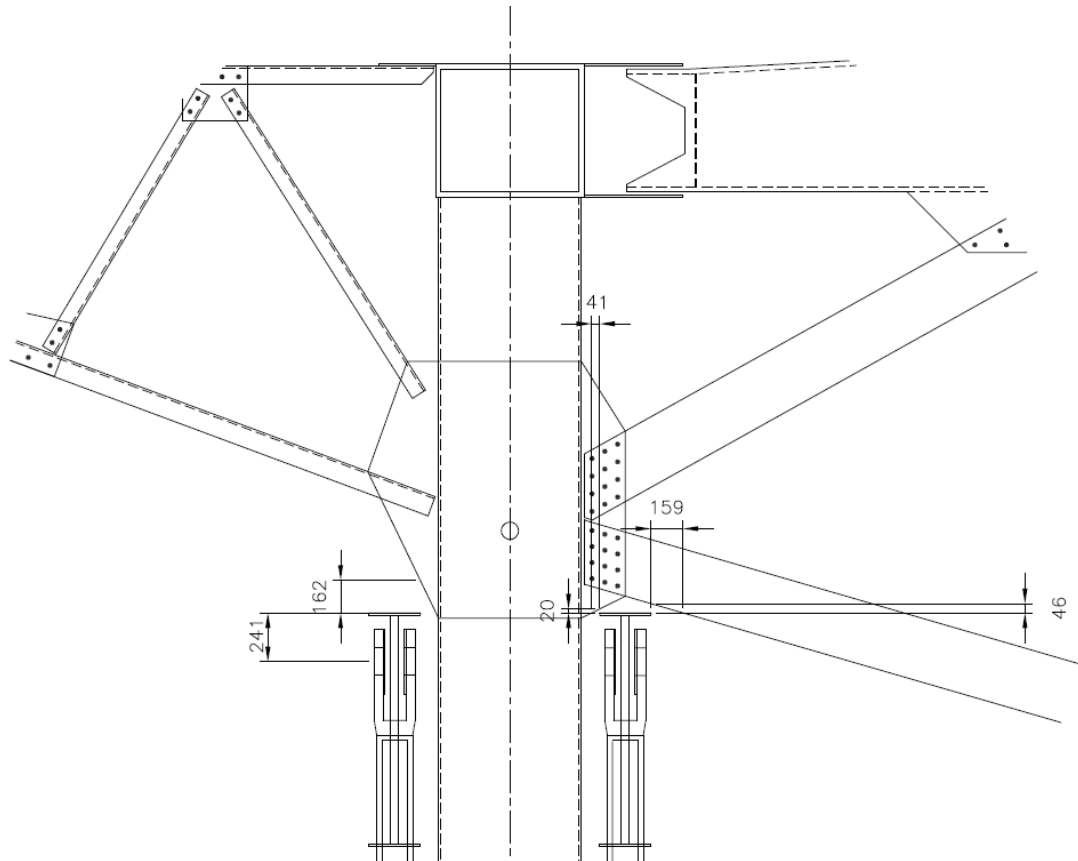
Relationship between top of bracket and side span cross girder. Main span similar
